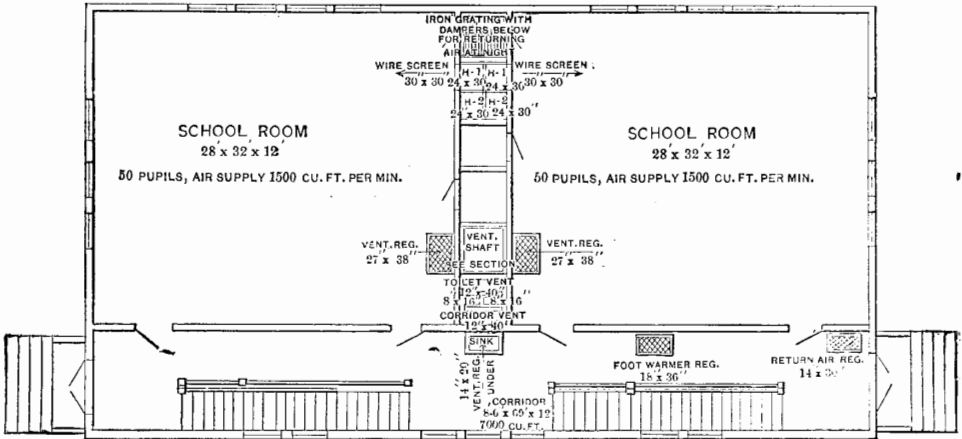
First-Floor Plan (12' 0") of School Building Heated by a Furnace System.
